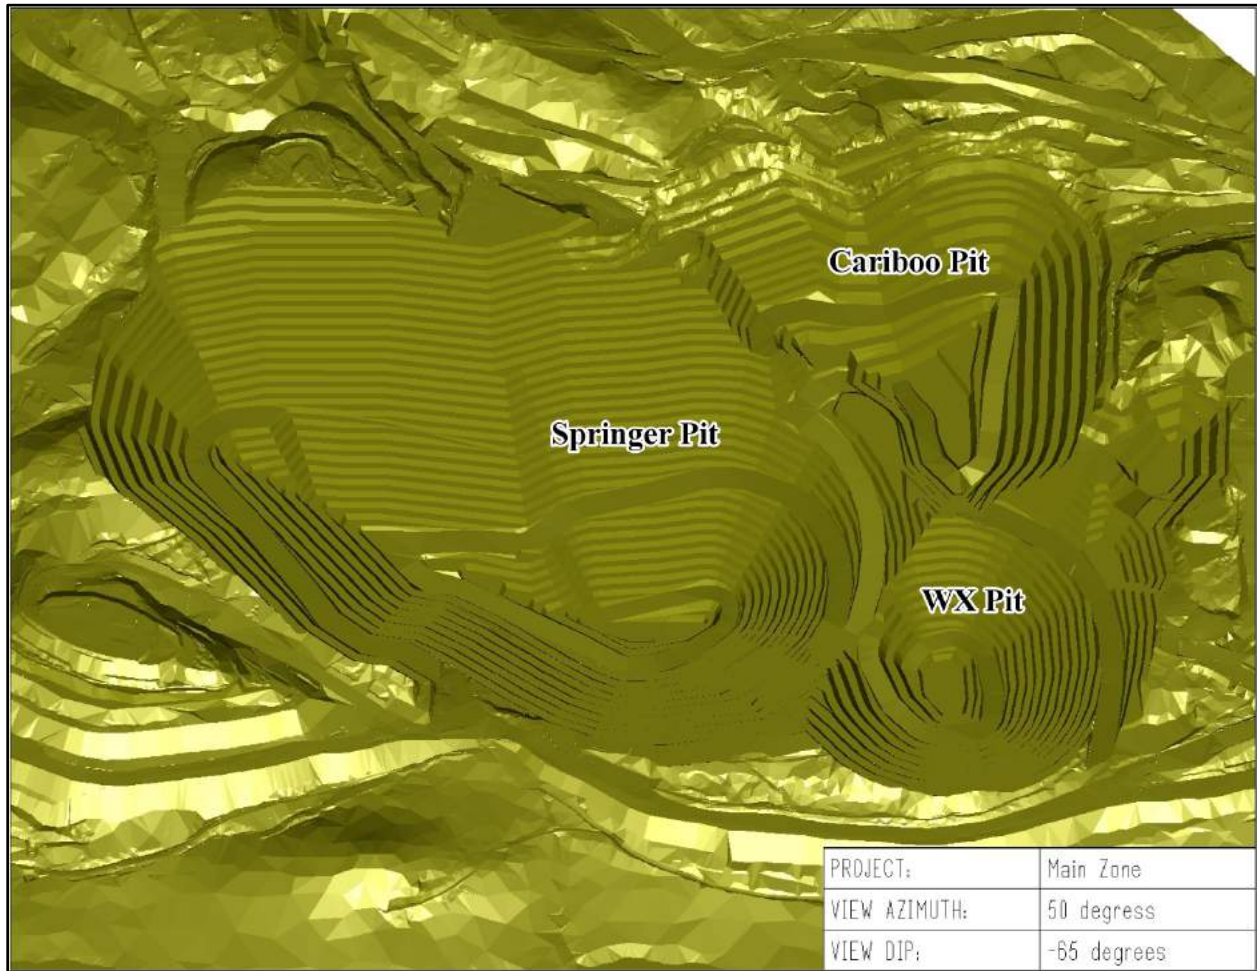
Isometric View of the Completed Springer Phase 5 Pushback
